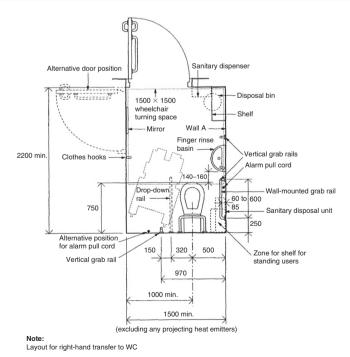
Example of a unisex wheelchair-accessible toilet with a corner WC. Dimensions in mm
